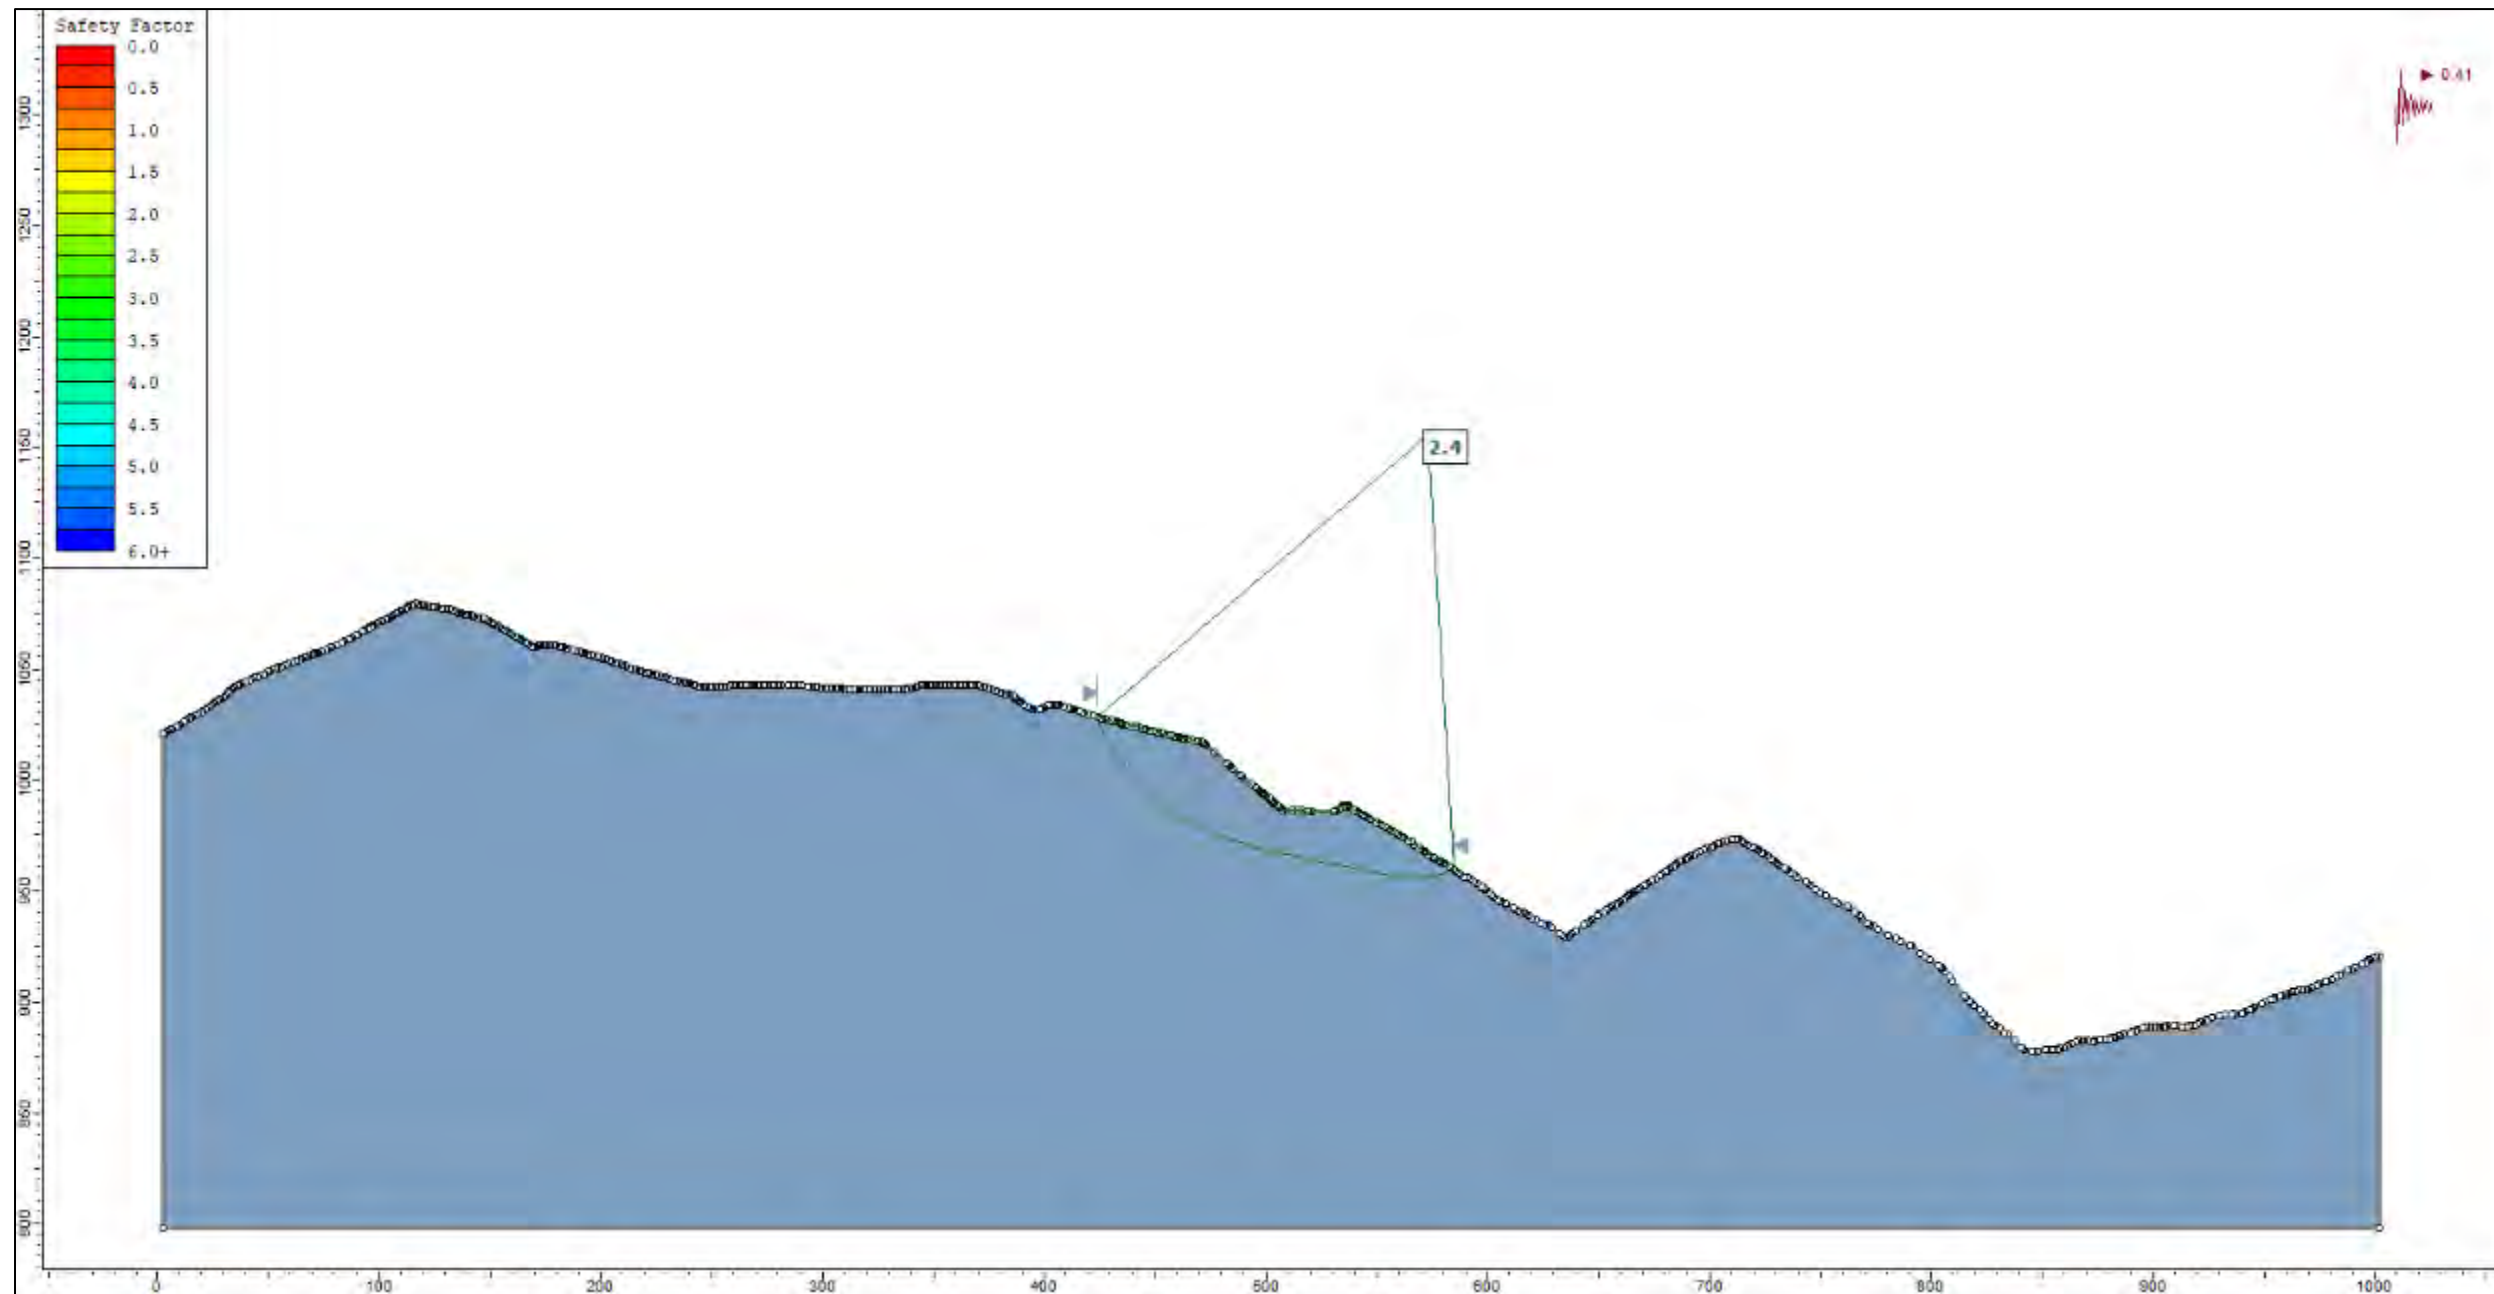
Haul Road Cut - Section 109 – ULS Conditions.
